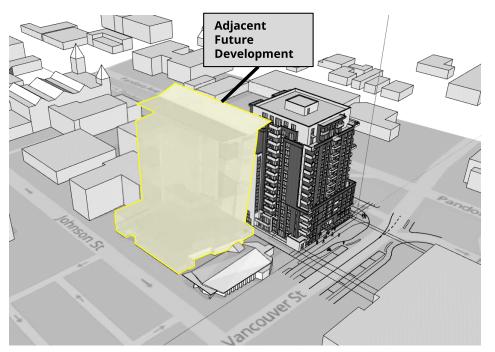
Rendering of Proposed Pandora 1468 Vancouver Street Development Including the Adjacent Future Development on Johnson Street (highlighted yellow)
